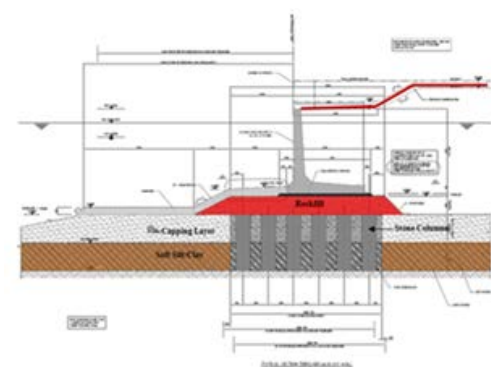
Precast L-Shaped Seawall on Stone Columns
